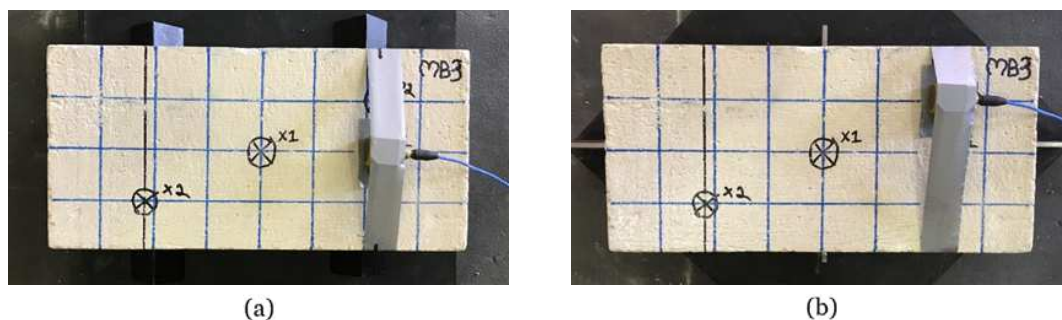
Accelerometer mounting using scrim-backed adhesive tape for (a) flexural test set-up and (b) torsional test set-up of IEV tests.
